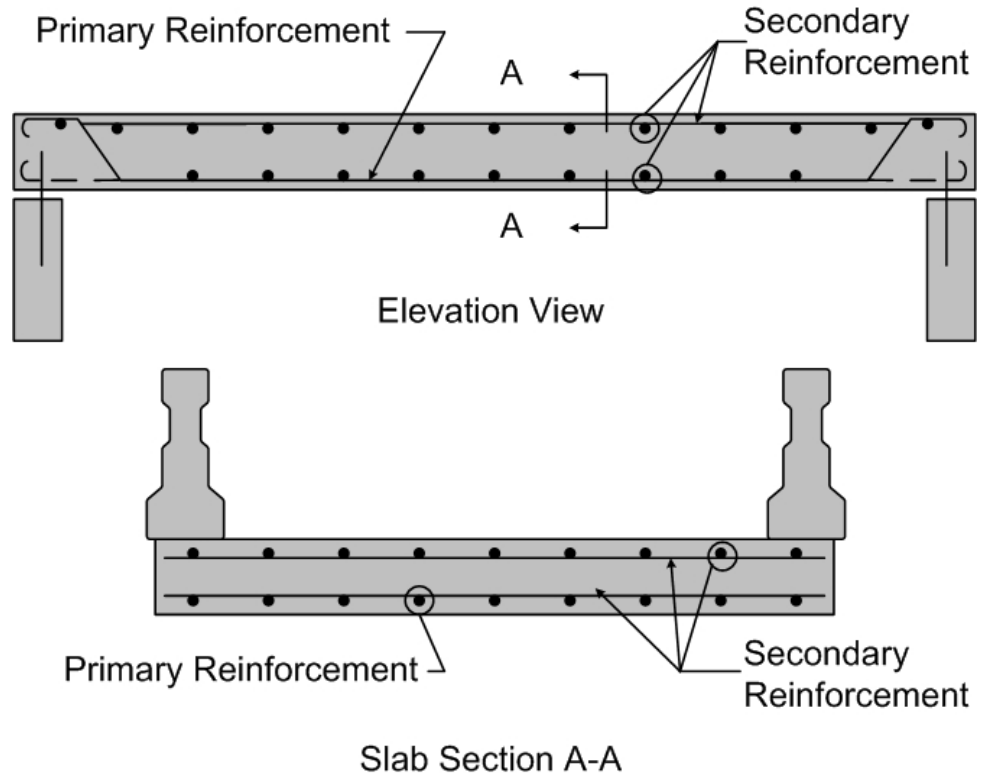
Steel Reinforcement in a Simply Supported Concrete Slab
